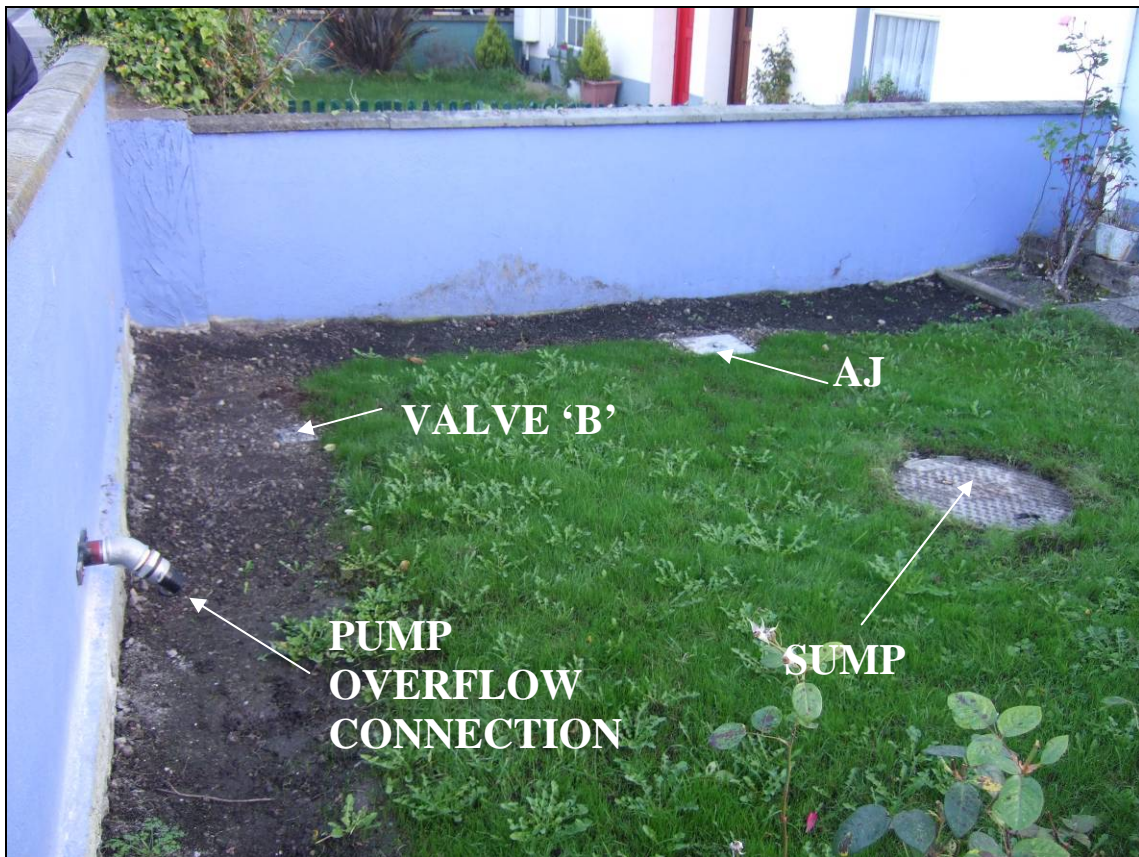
Location of Manhole 1 on Coosan Point Road
